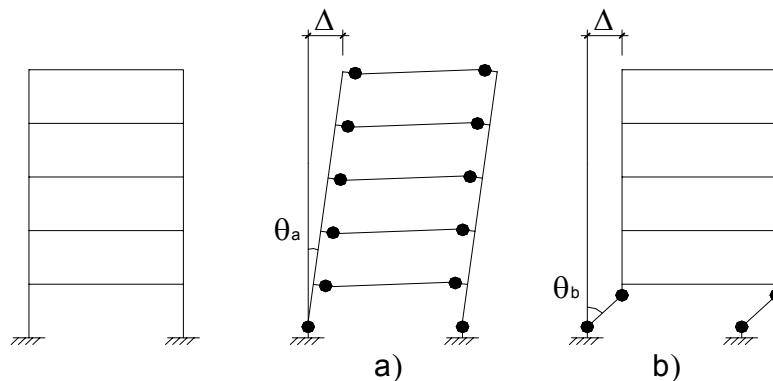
Application of the capacity design procedure to a multi-storey two-dimensional frame (adapted from Paulay and Priestley, 1992)
